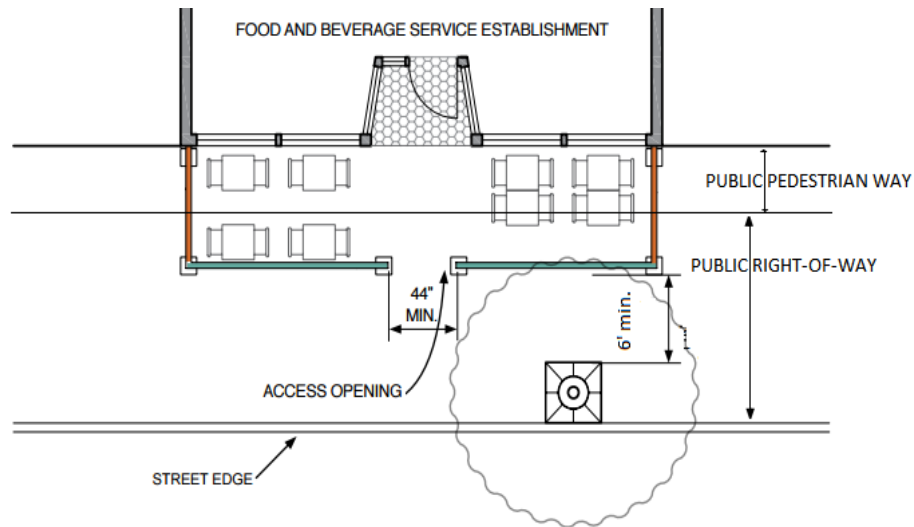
2 Sidewalk Cafe plan view diagram (Example)
